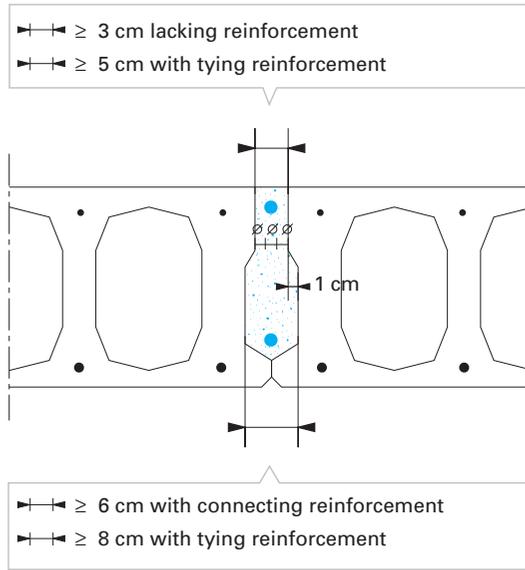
Longitudinal joint: minimum dimensions in presence of connecting reinforcement and when tying reinforcement is called for (Italian Prefab Regulations, par. 2.11.2 b point 3)
